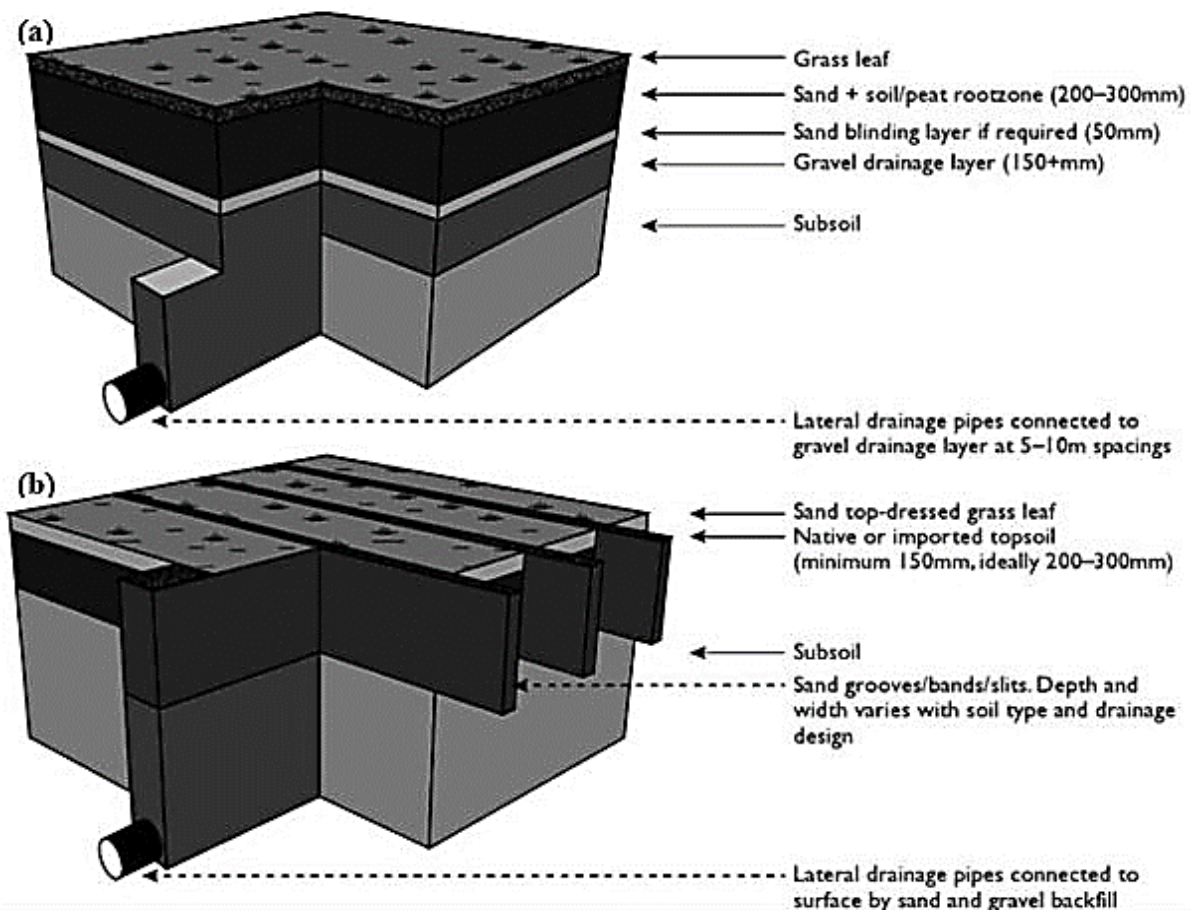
A cross section of two common natural turf construction sections (a) shows a sand rootzone system common in stadiums (b) shows a sand top-dressed system with sand slits to aid rapid drainage of surface water [1]
